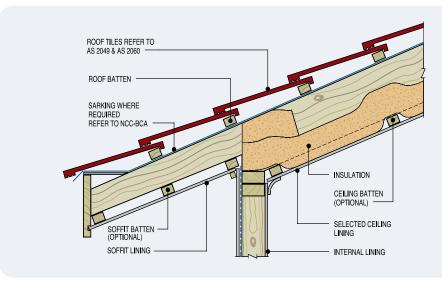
Cathedral Roof/Ceiling Construction. Section through roof
